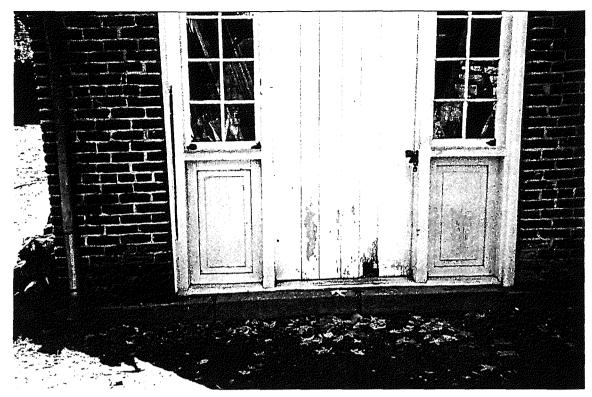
John Brown's Fort, door and sidelights at eastern bay of north elevation. Note gutter discharges at base of building.
